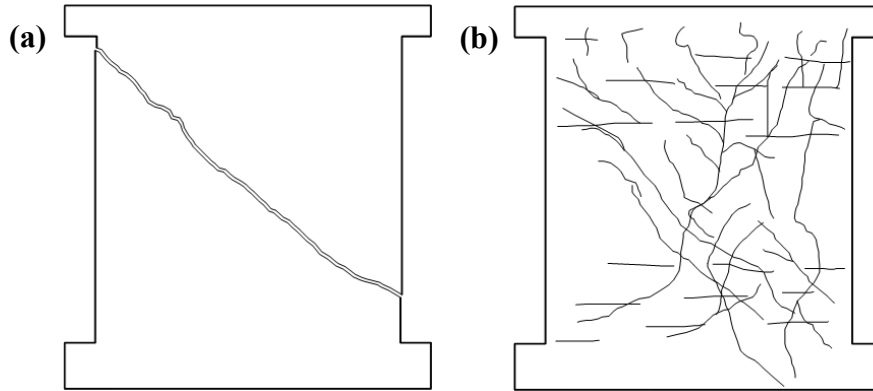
Modes of shear failure: (a) Brittle shear failure; (b) Ductile shear failure (adapted from Voon 2007)
